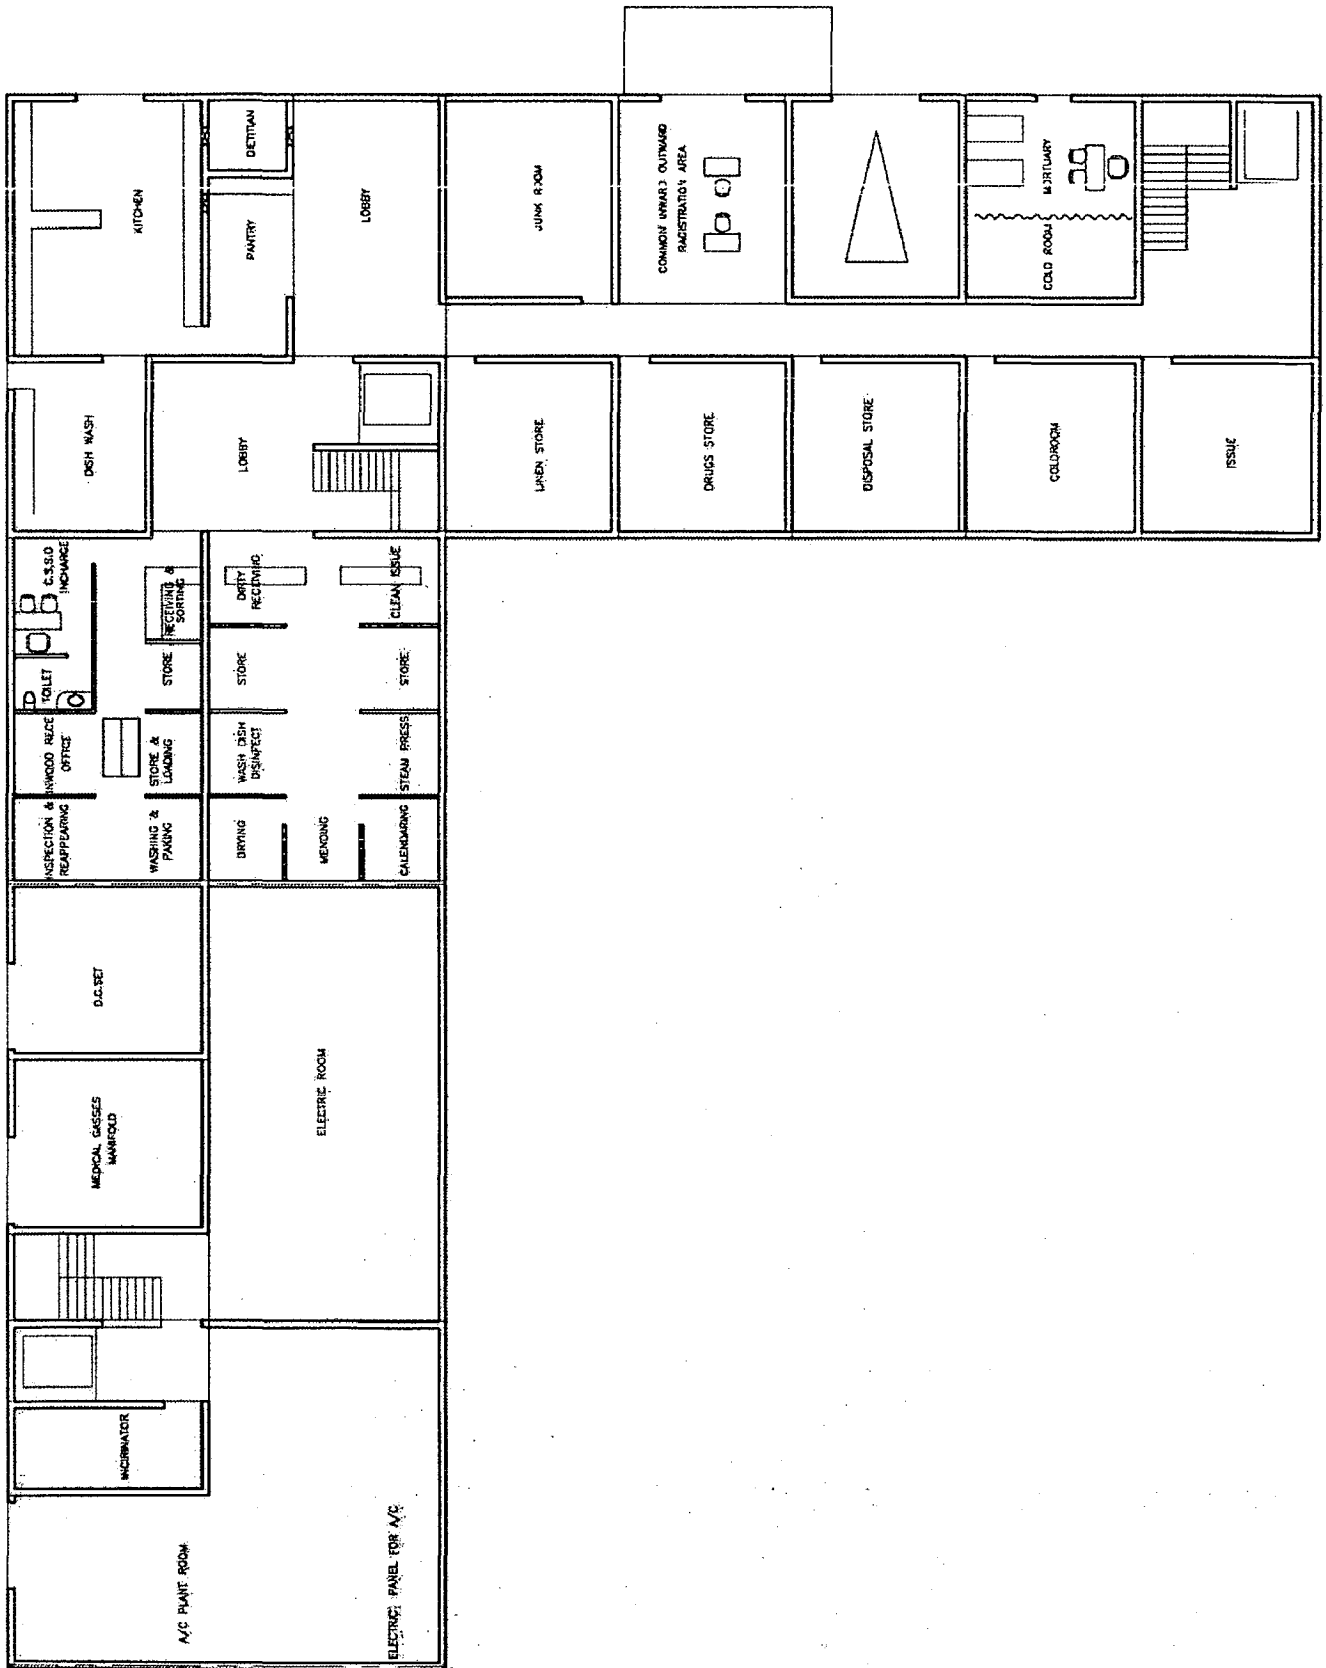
CITY HOSPITAL – BASEMENT FLOOR PLAN
